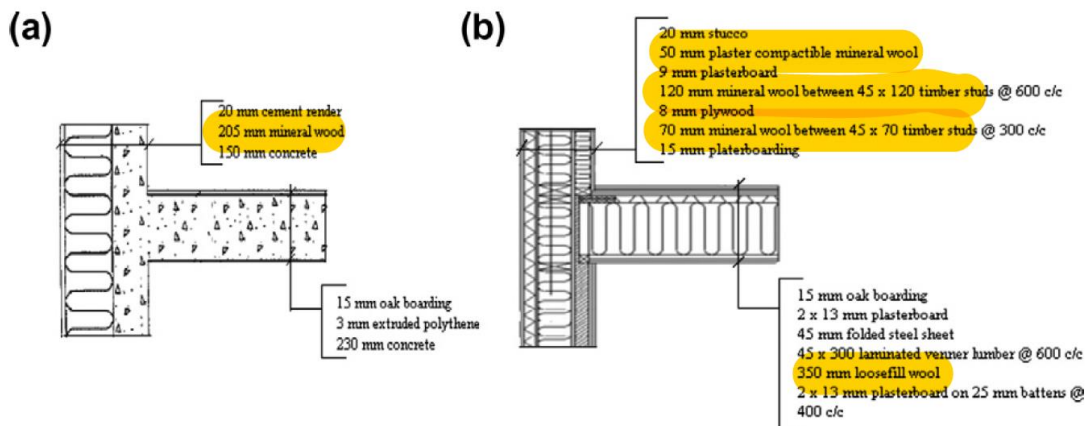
Wall and floor construction details for the functionally equivalent (a) concrete-frame and (b) wood-frame reference building.
